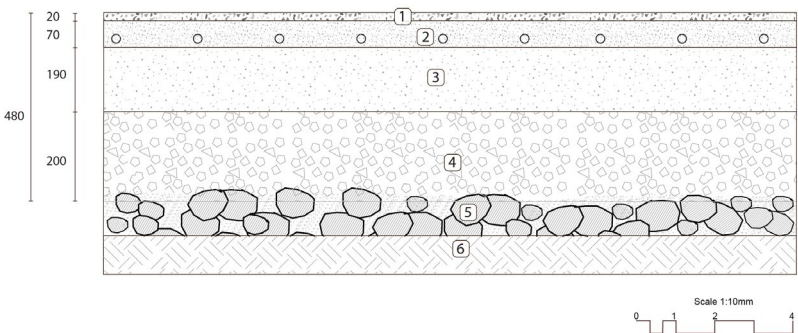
Ground-floor entrance details- Scale 1:10 (Author's drawing)
